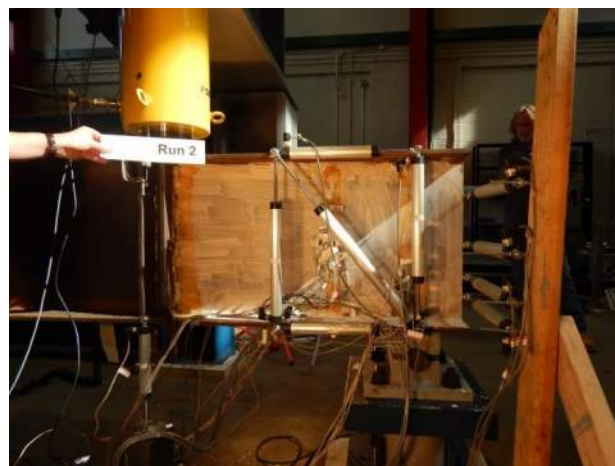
Undamaged Girder Left: 60 kip
